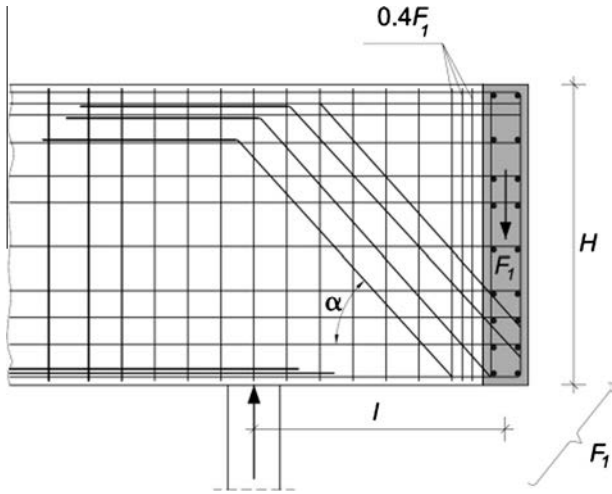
Reinforcement of a cantilever deep beam according to Schroeder [16].
